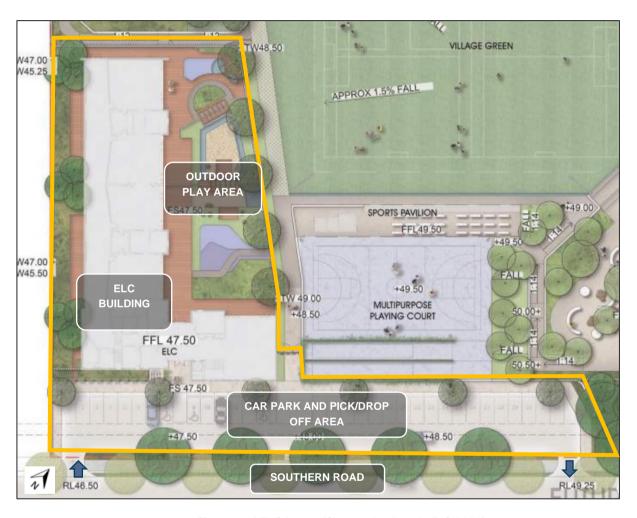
| ELC layout (Source: Applicant's RtS 2020)
